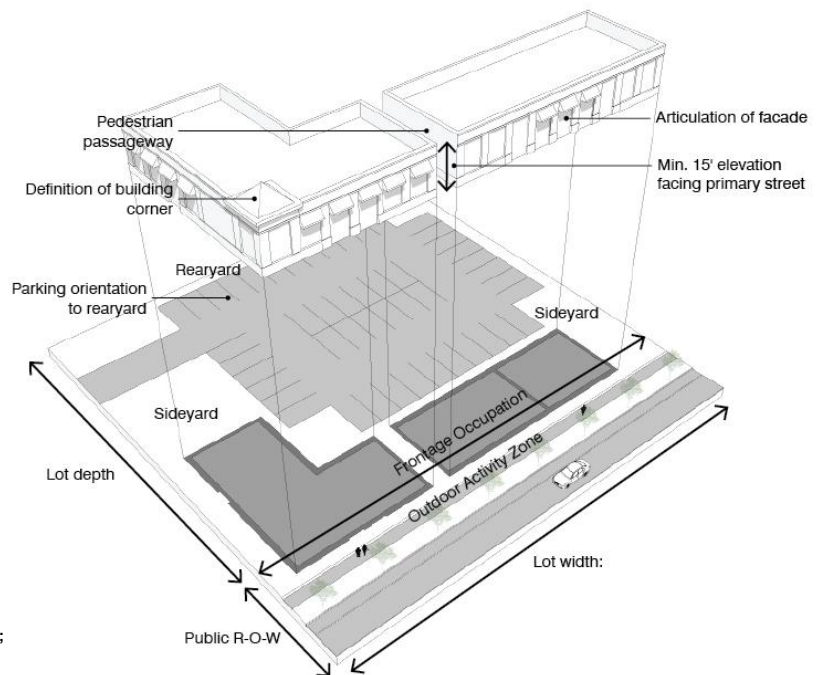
BUILDING AND SITE TYPES
